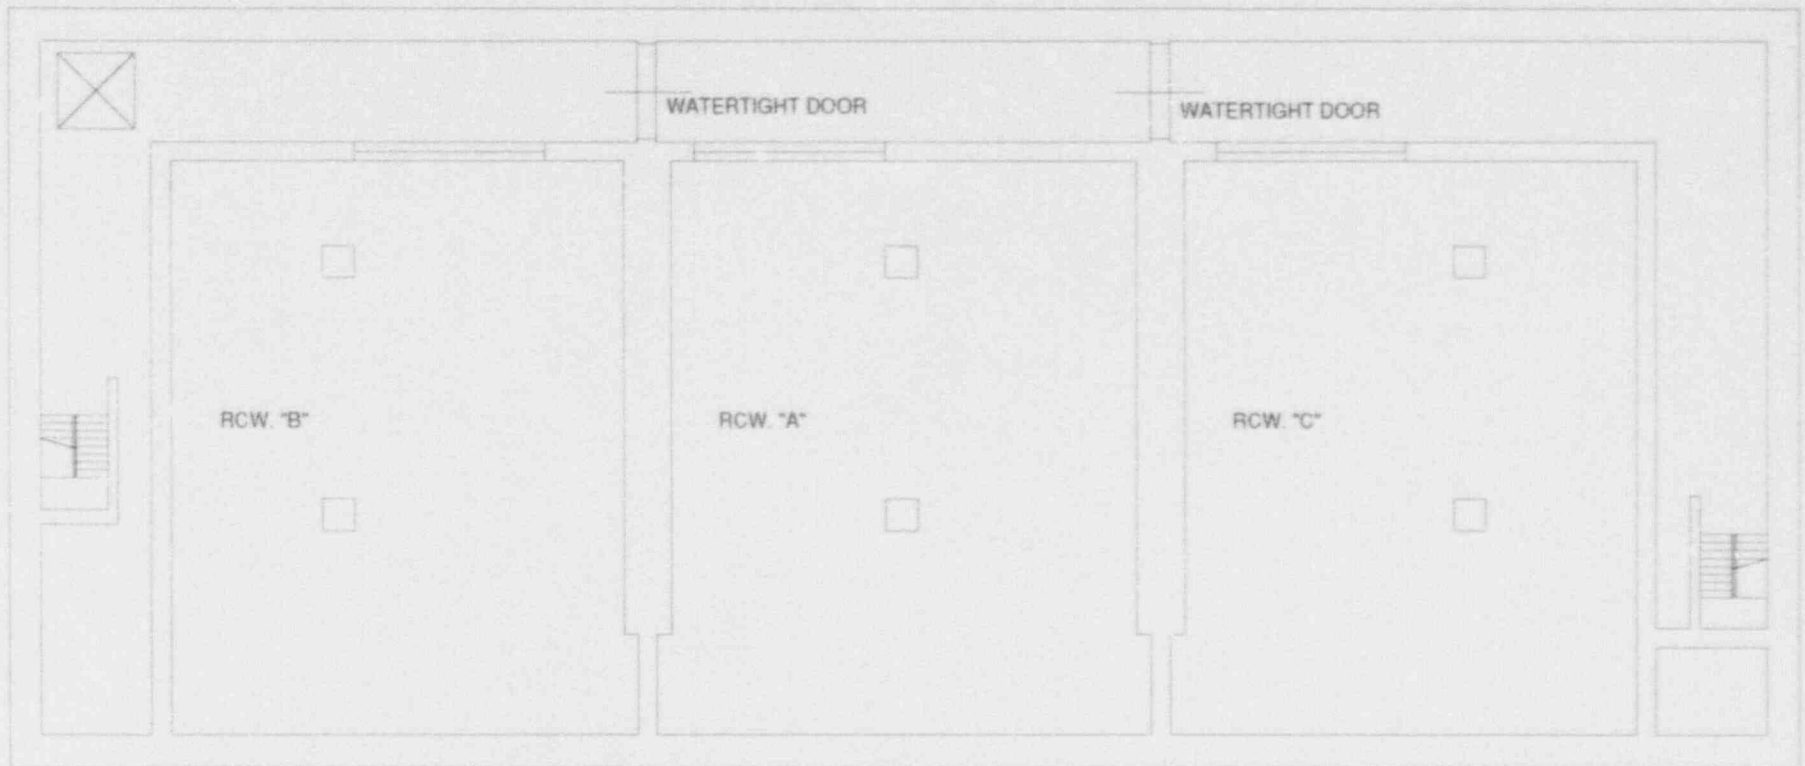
CONTROL BUILDING FLOOR B4F
